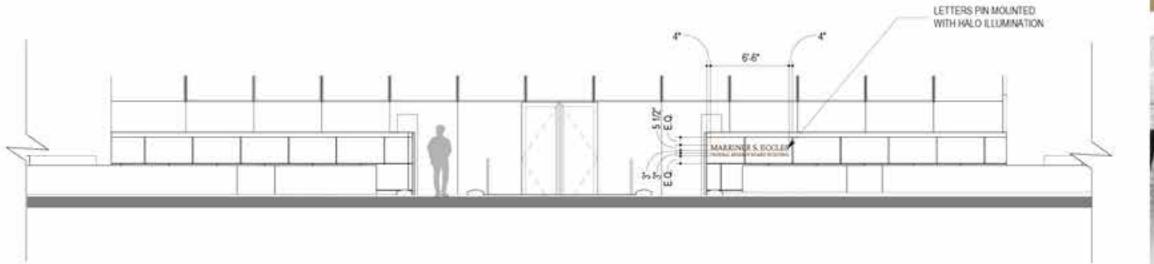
Eccles - Signage At 20th Street Connection / Building Entry
